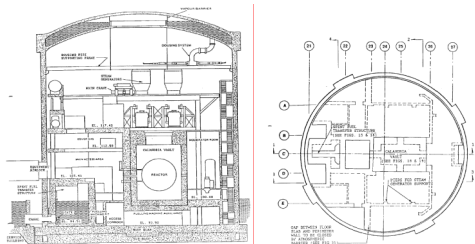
Containment cut drawing (a) vertical cut view and (b) horizontal cut view
